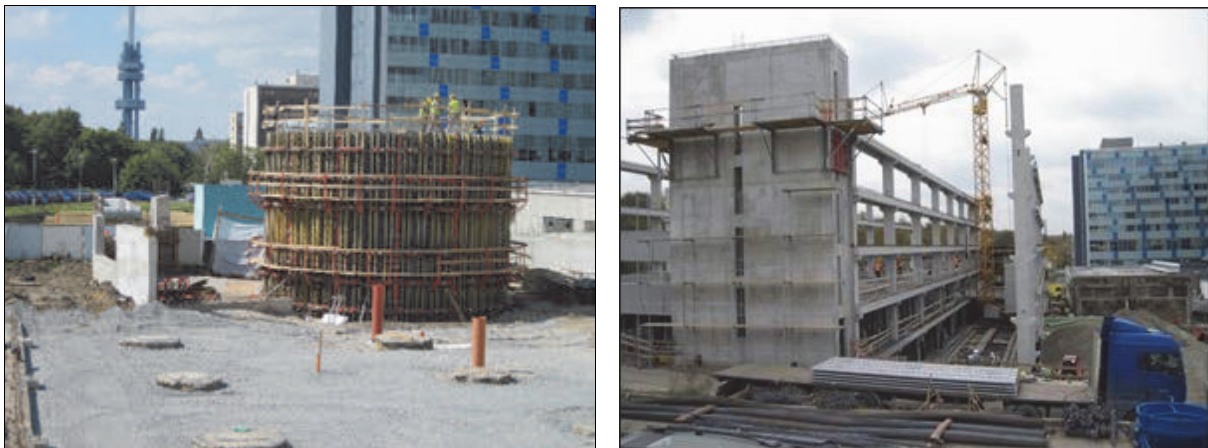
The new fire water tank (left); execution of the precast frame (right)
